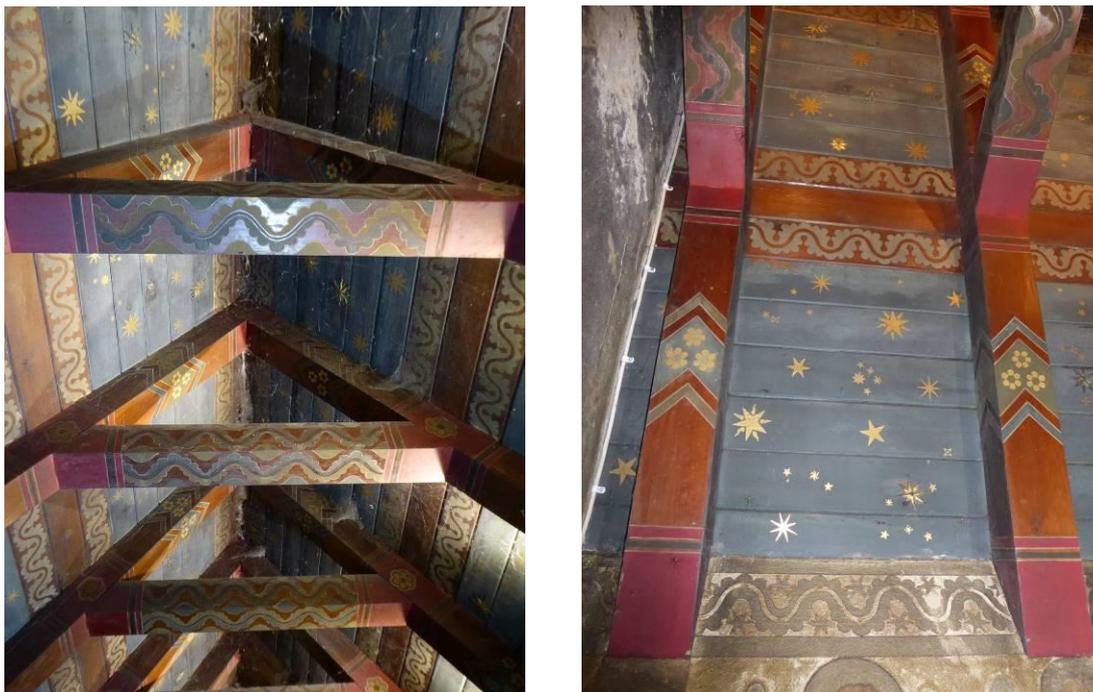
& Figure 20: Overview of painted roof timbers showing extent of cobwebs and dirt deposits (left) and detail of north-west panels
